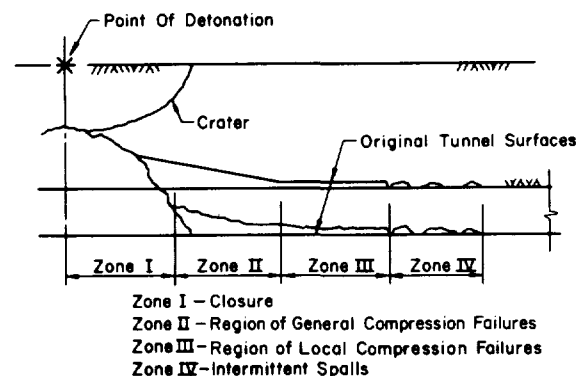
DAMAGE ZONES IN ROCK TUNNELS
